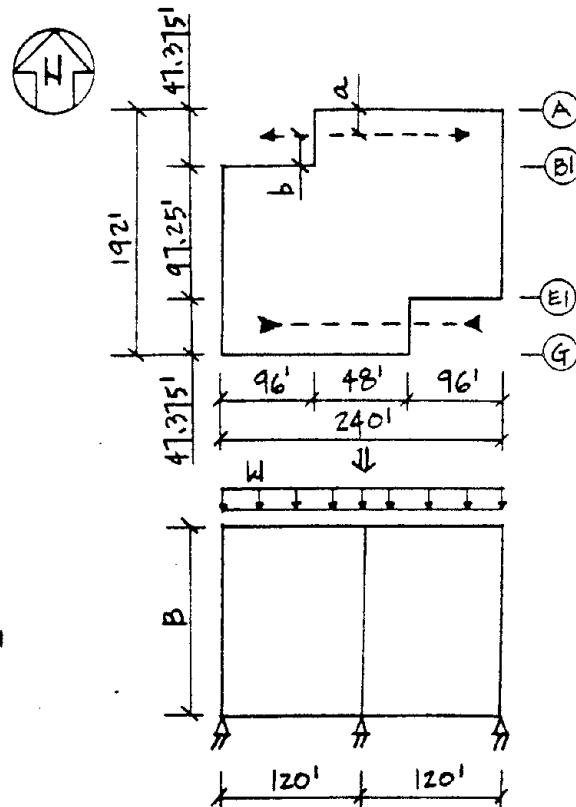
Roof Diaphragm Period, North-South Direction Earthquake, 490 Jarvis Drive Building
